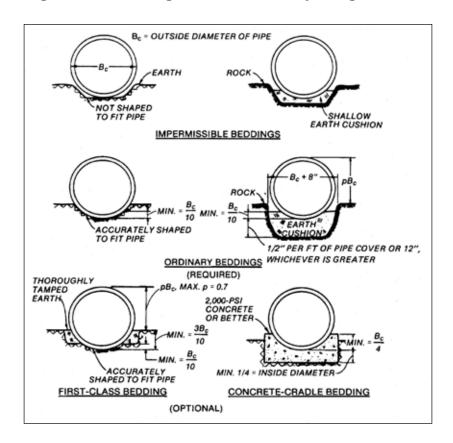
Installation Conditions that Influence Loads on Underground Conduits
